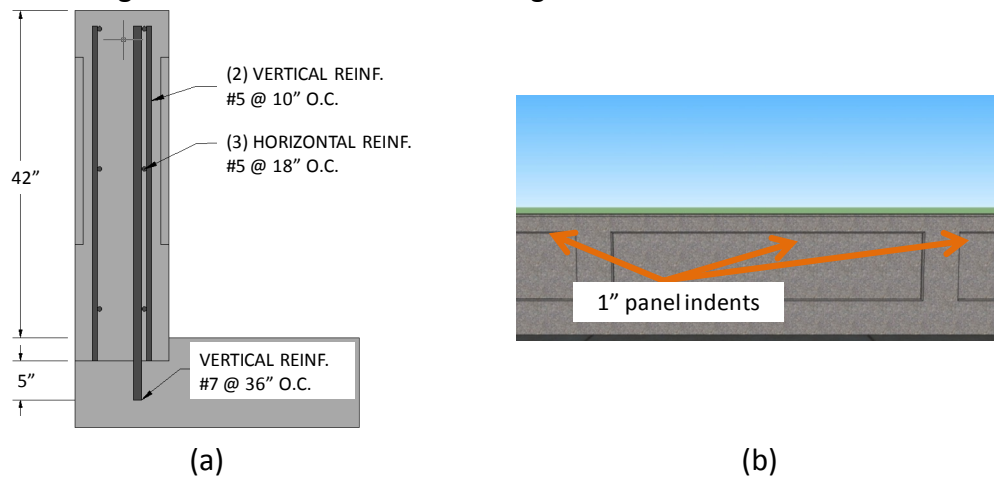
Recommended design option for Section 1 (handrail): (a) elevation view of concrete wall and reinforcement and (b) panel indents mimicking historic concrete parapet
